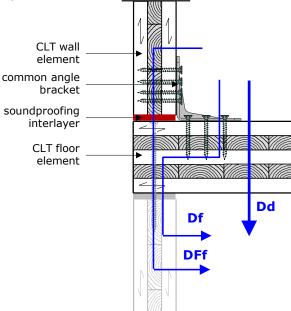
Wall-to-floor-to-wall joint of a typical CLT building with direct (Dd) and flanking transmission paths (DFf and Df)
